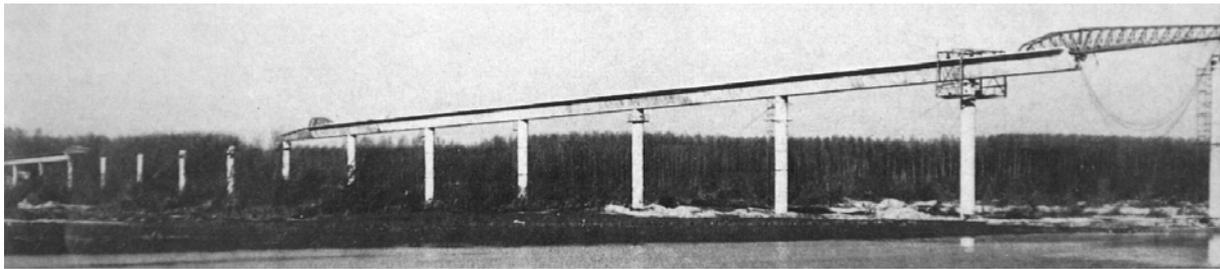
Complete bridge unit being incrementally launched into place during construction of a pipeline bridge over the Po River near Pavia, Italy. (Wittfoht)
